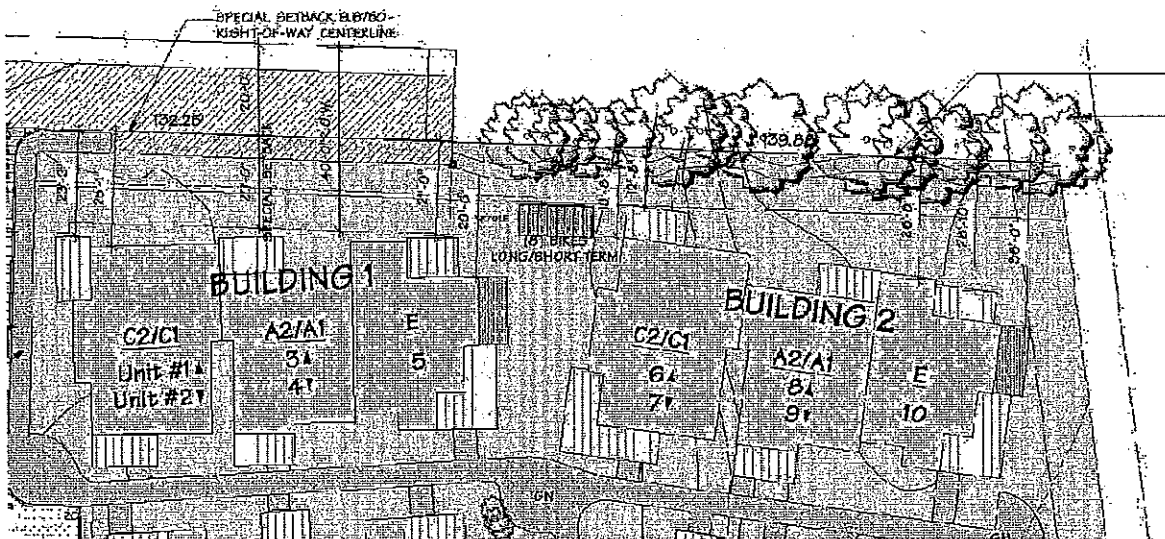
Proposed Building Setbacks with proposed heights for Building 1 and Building 2 of the Oakleigh Meadow Cohousing project on lot #400.
